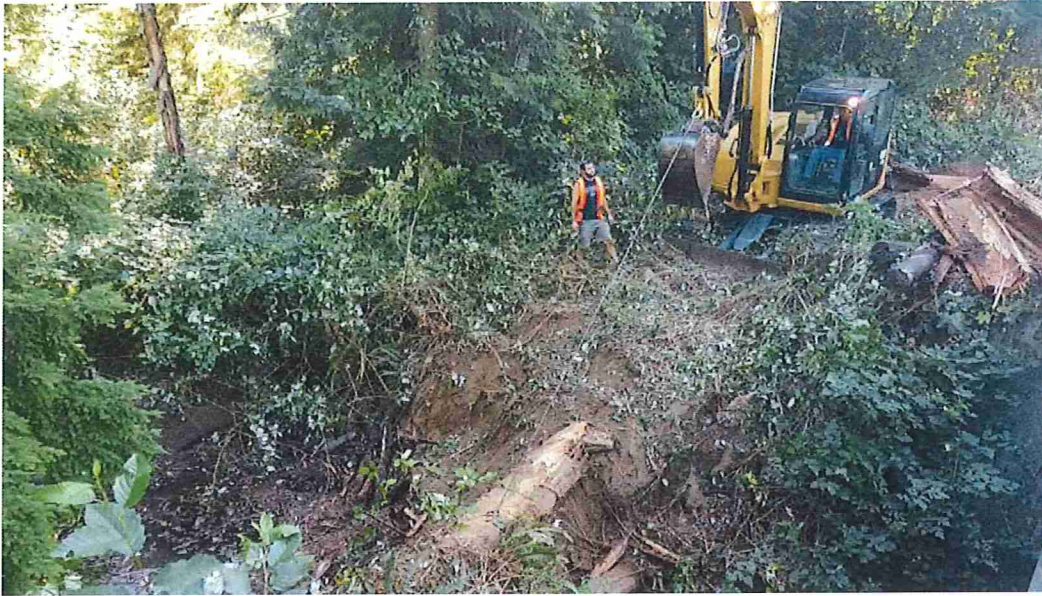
Systematic removal of old footbridge and excavator working from the top of bank.
